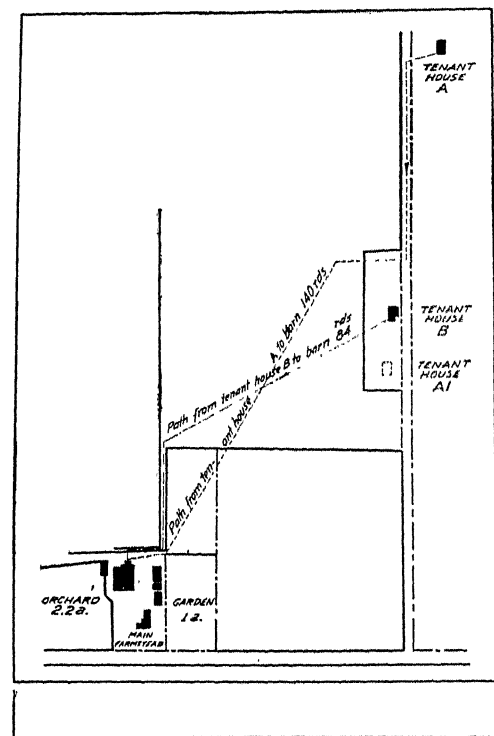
PLAN SHOWING IMPROVEMENT IN LOCATION OF TENANT HOUSE
